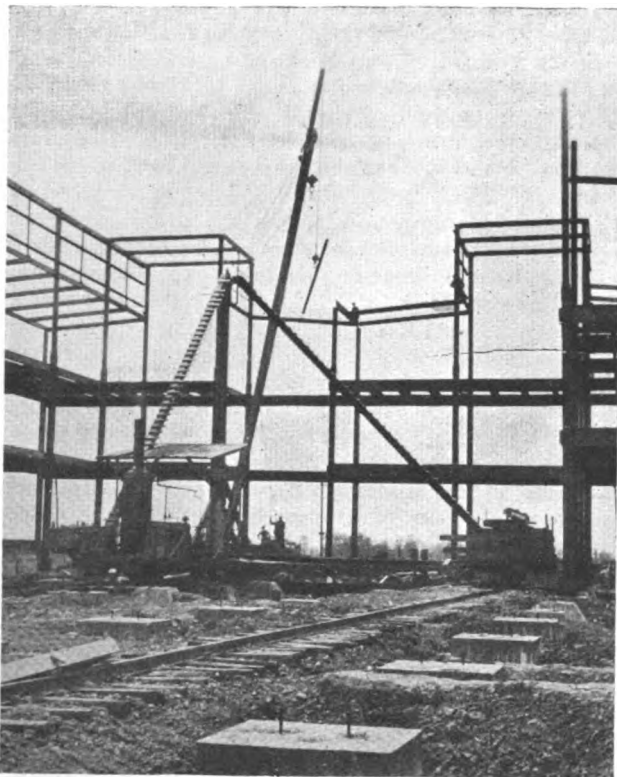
TRAVELLING DERRICK ERECTING STEELWORK.
